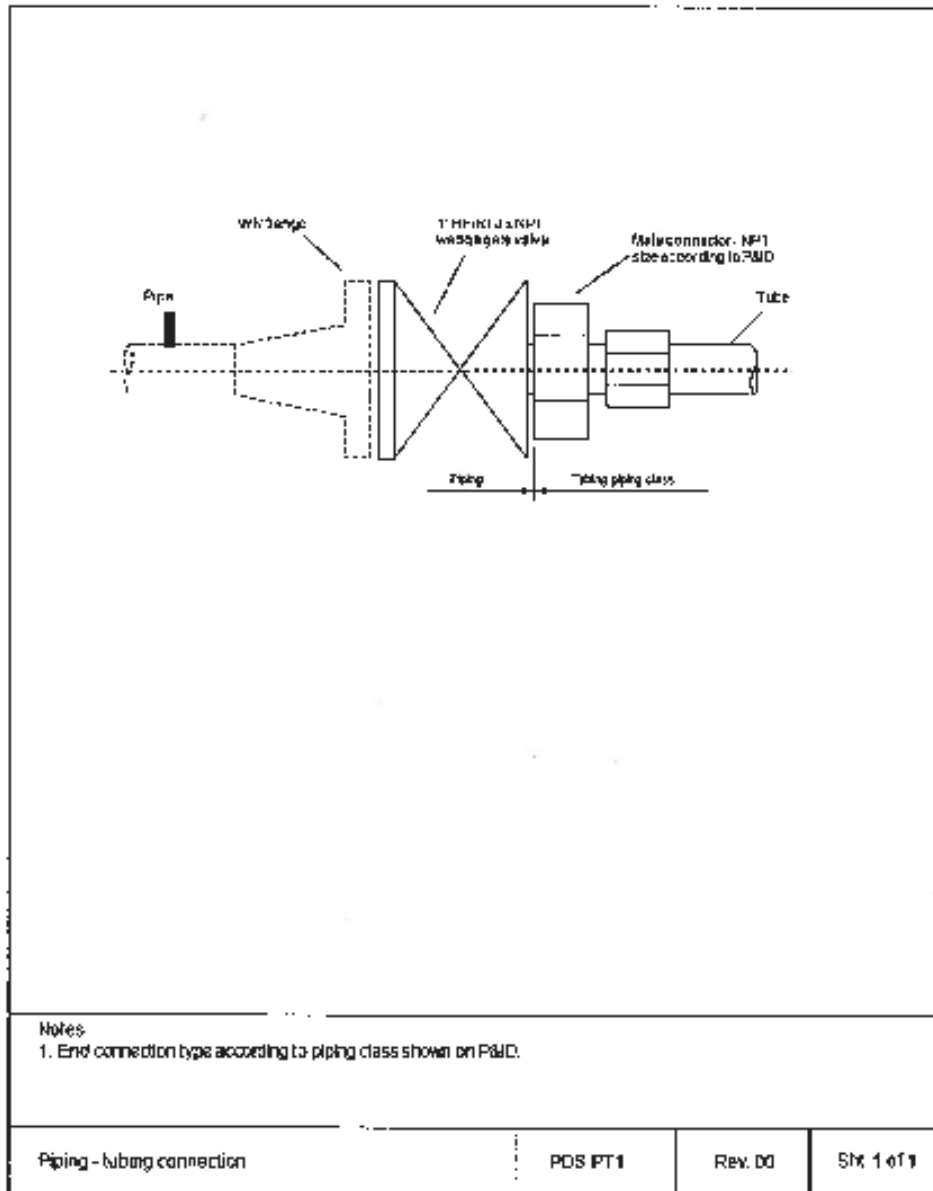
PDS PT1, Piping Tubing Connection
